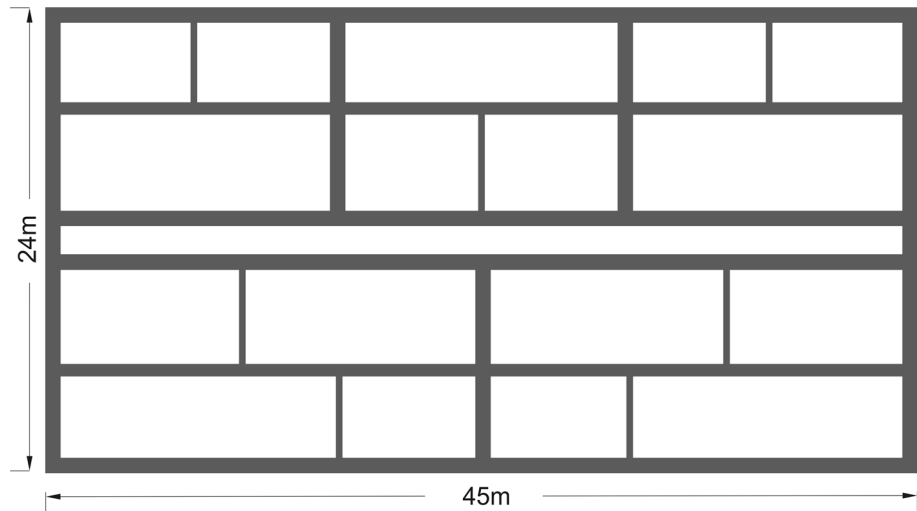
Wall model of the single-family detached home (pictorial plan of storey)
